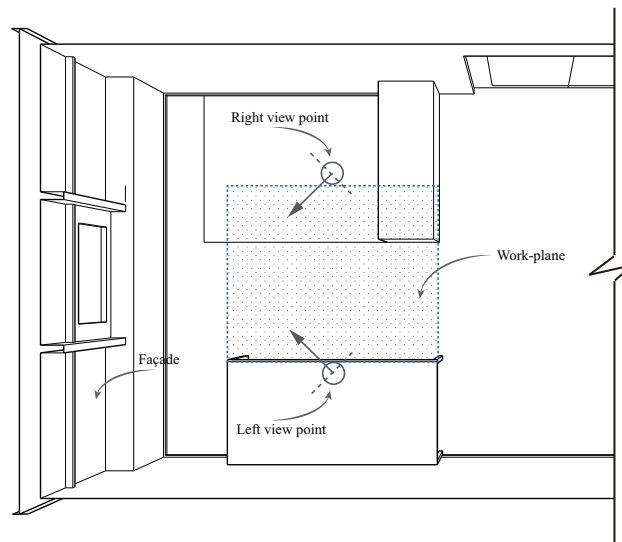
Floor-plan showing defined work-plane position and view directions
